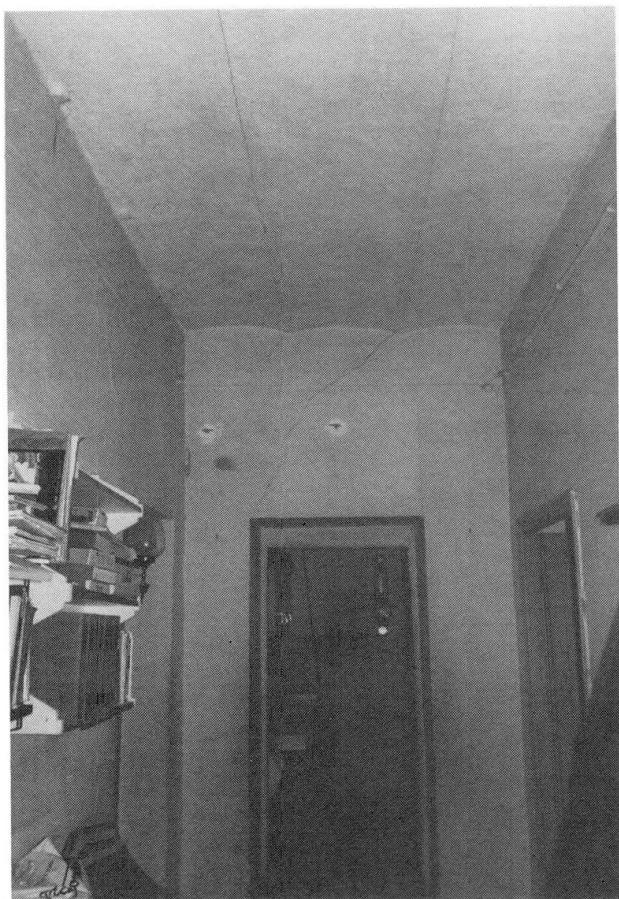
Some of the most significant cracks on the masonry structures
